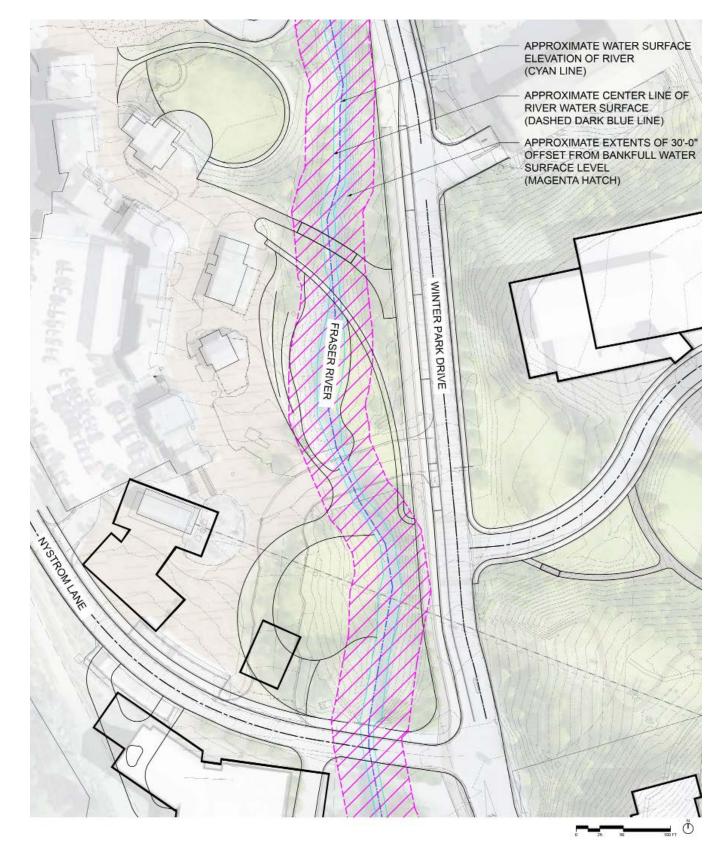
WATER QUALITY & STORMWATER PLAN
